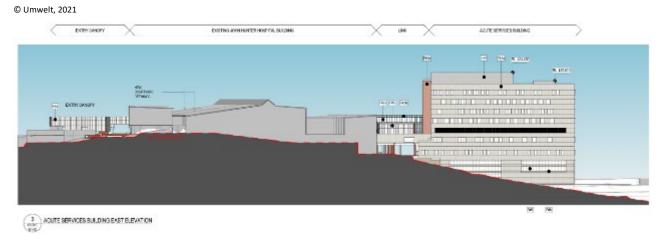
Elevation view of the proposed new ASB (right of image) in relation to the existing JHH building (left of image) showing the comparative scale
